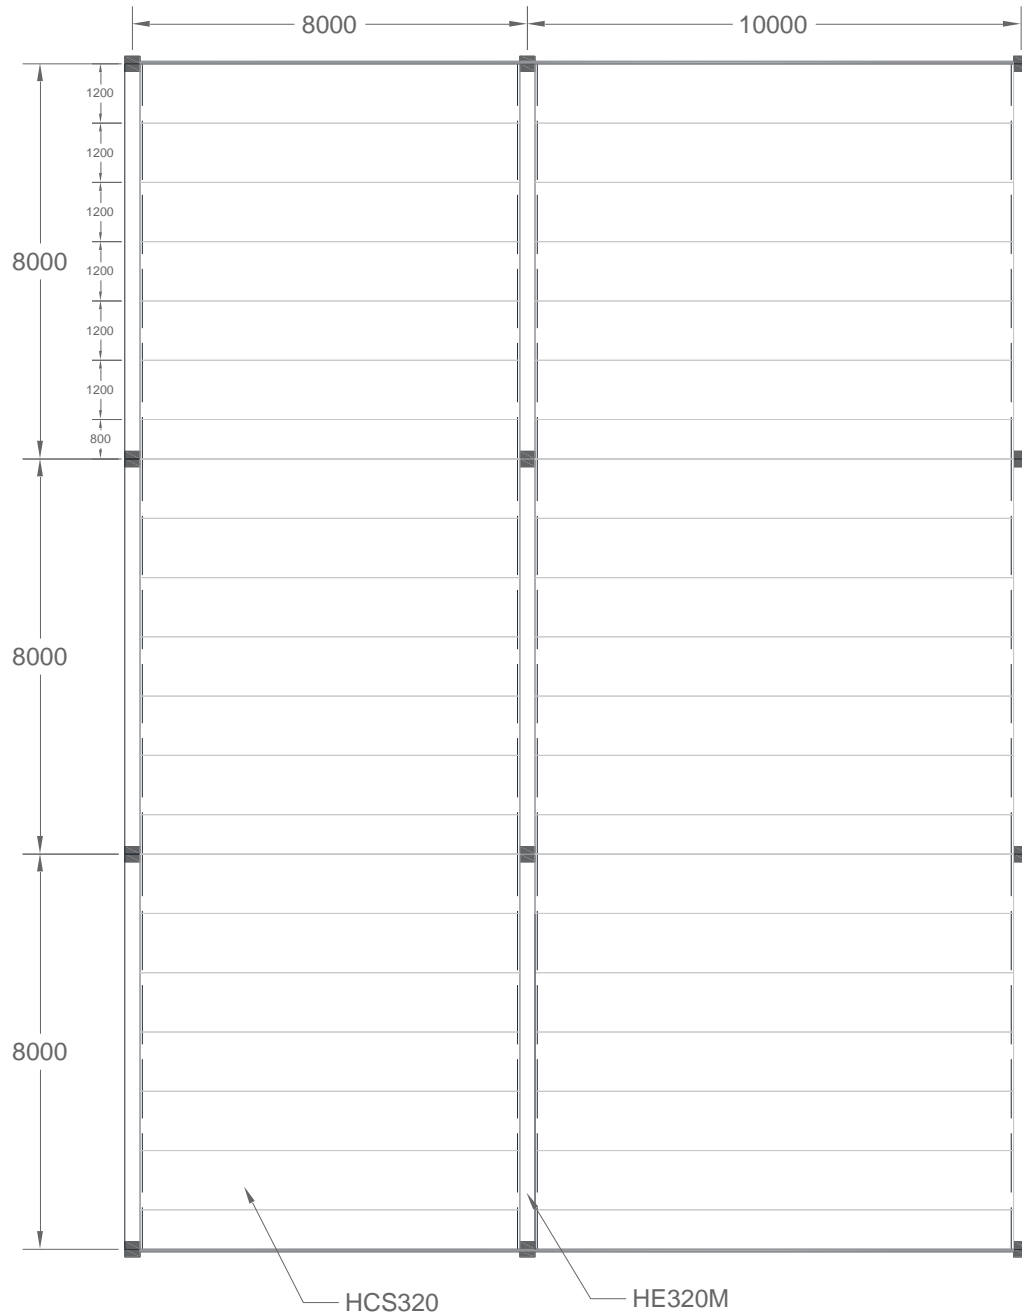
Typical floor with slim floor beams and hollow-core slabs (Example 1)
